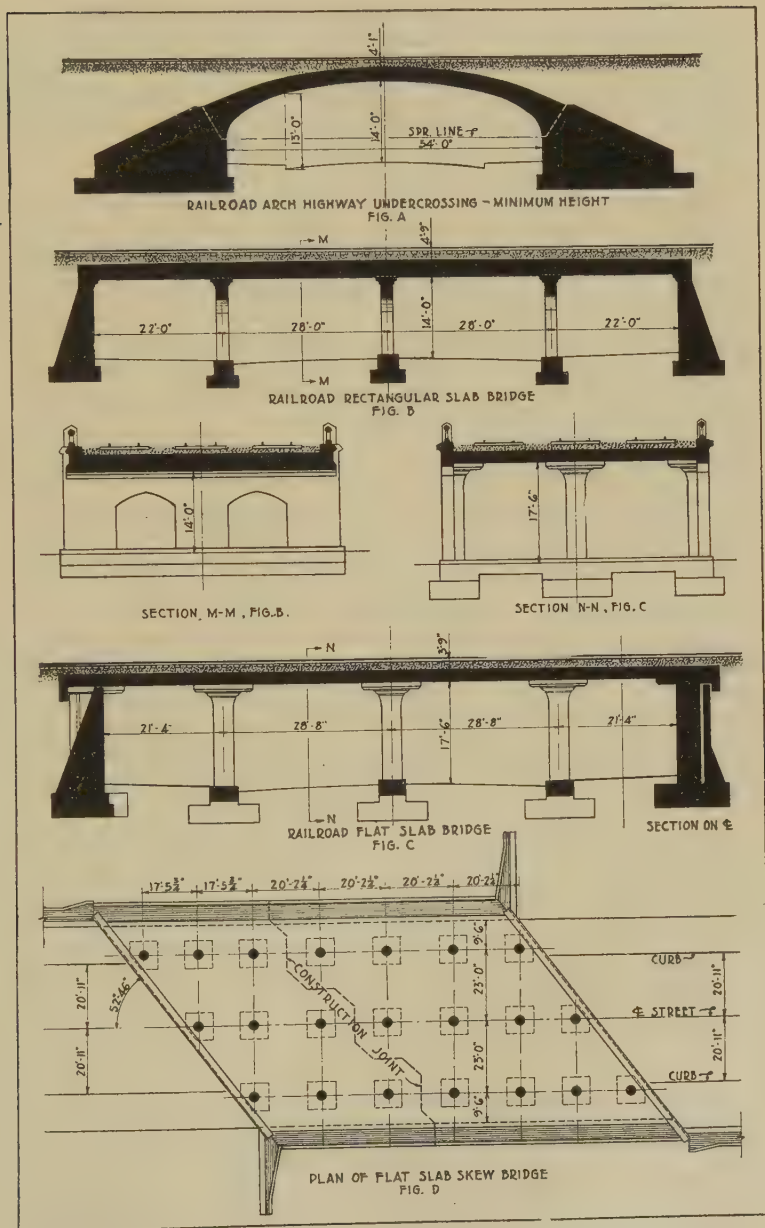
SECTIONS OF SINGLE AND MULTIPLE-SPAN CONCRETE BRIDGES.
